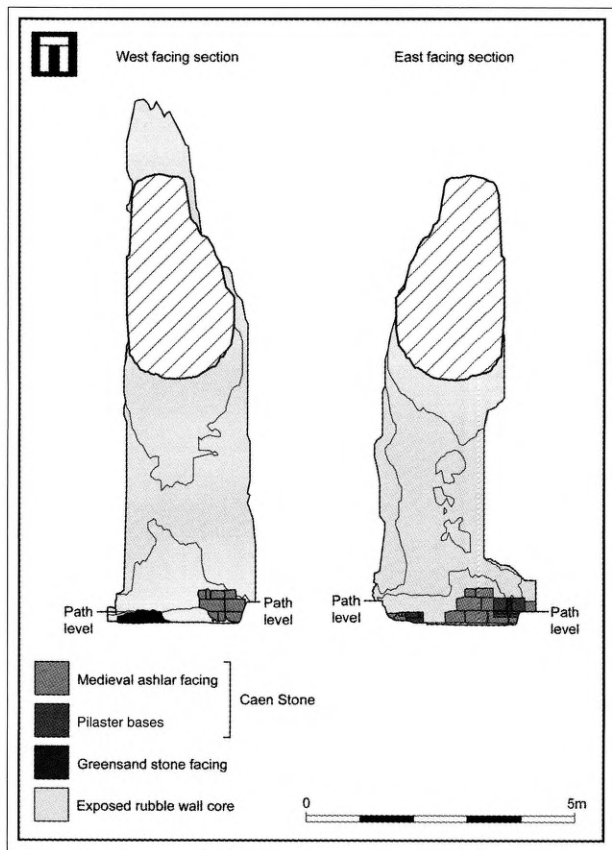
East and west facing sections of the cloister arch, showing probable medieval footings beneath the surviving structure
